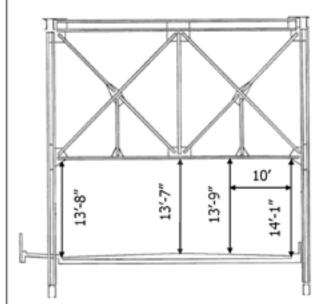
Cross-section view of through truss bridge showing vertical clearances.
